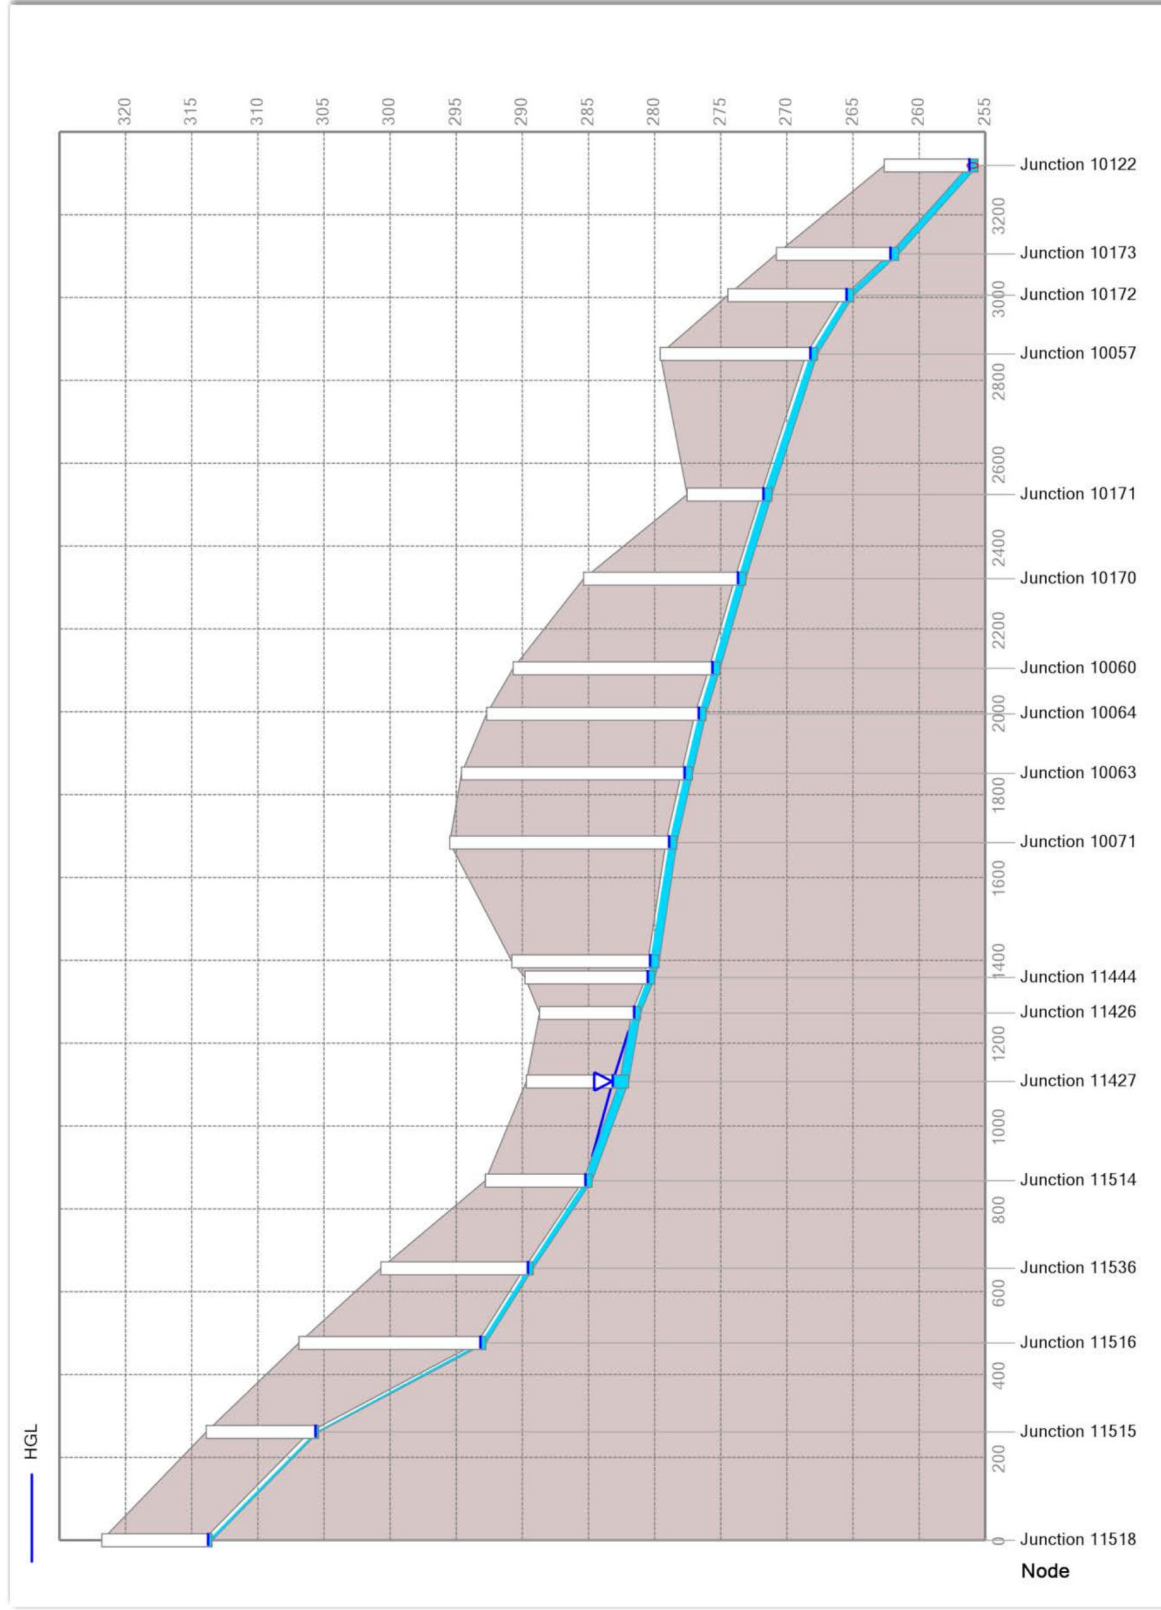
13th and Division Street sewer profile, 1- in 10-year storm event, pipes upsized
